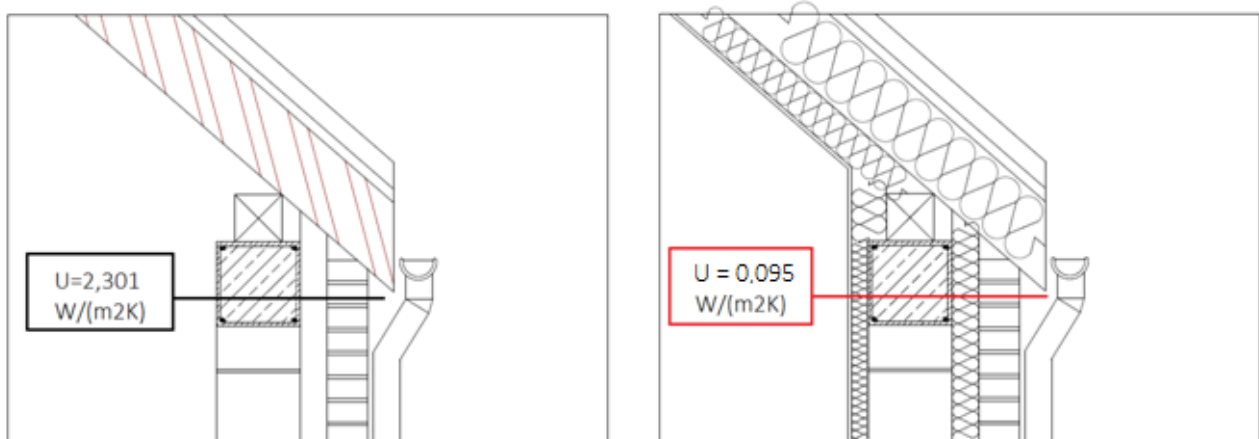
Cross section at the place of backrest wall plate on the ting beam.
